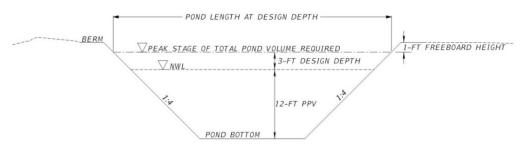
POND SIZING TYPICAL SECTION (NOT TO SCALE)
